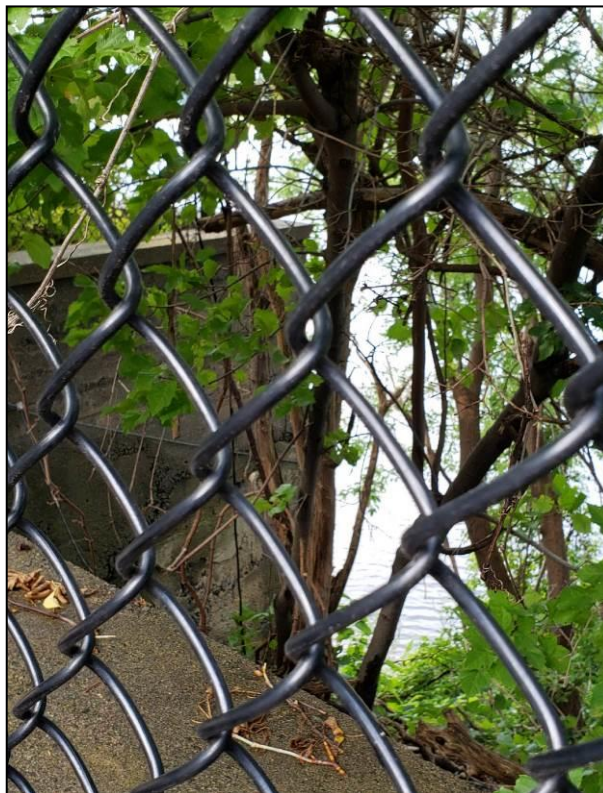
View of the concrete retaining wall at the northern end of the property, facing southwest. (PR19-032D012)
